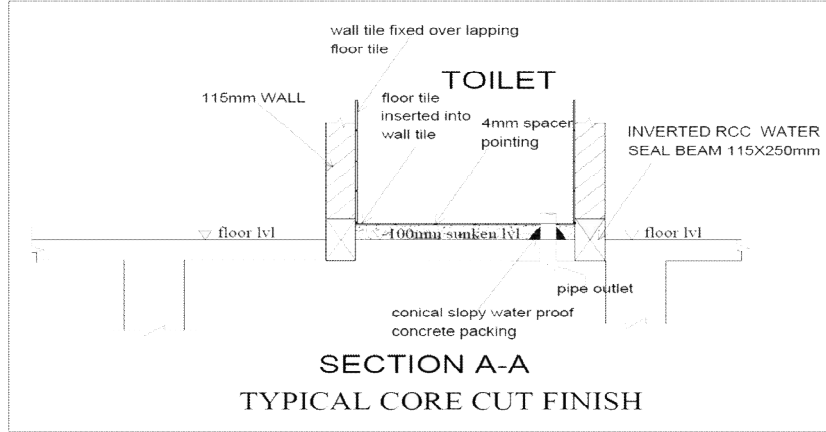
TYPICAL CORE CUT & TILE LAYING SEQUENCE
